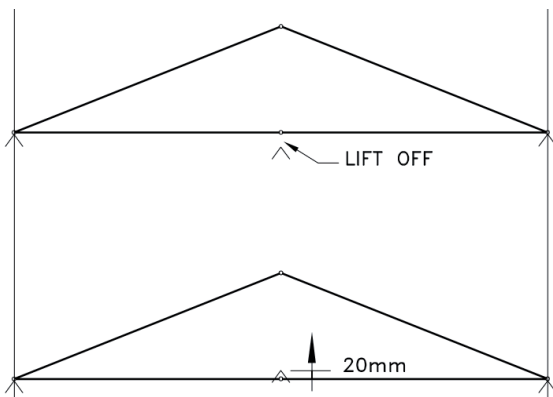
Consequence of footing movement on rigid trusses employing internal walls for support: edge heave (above) and centre heave (below) cases
